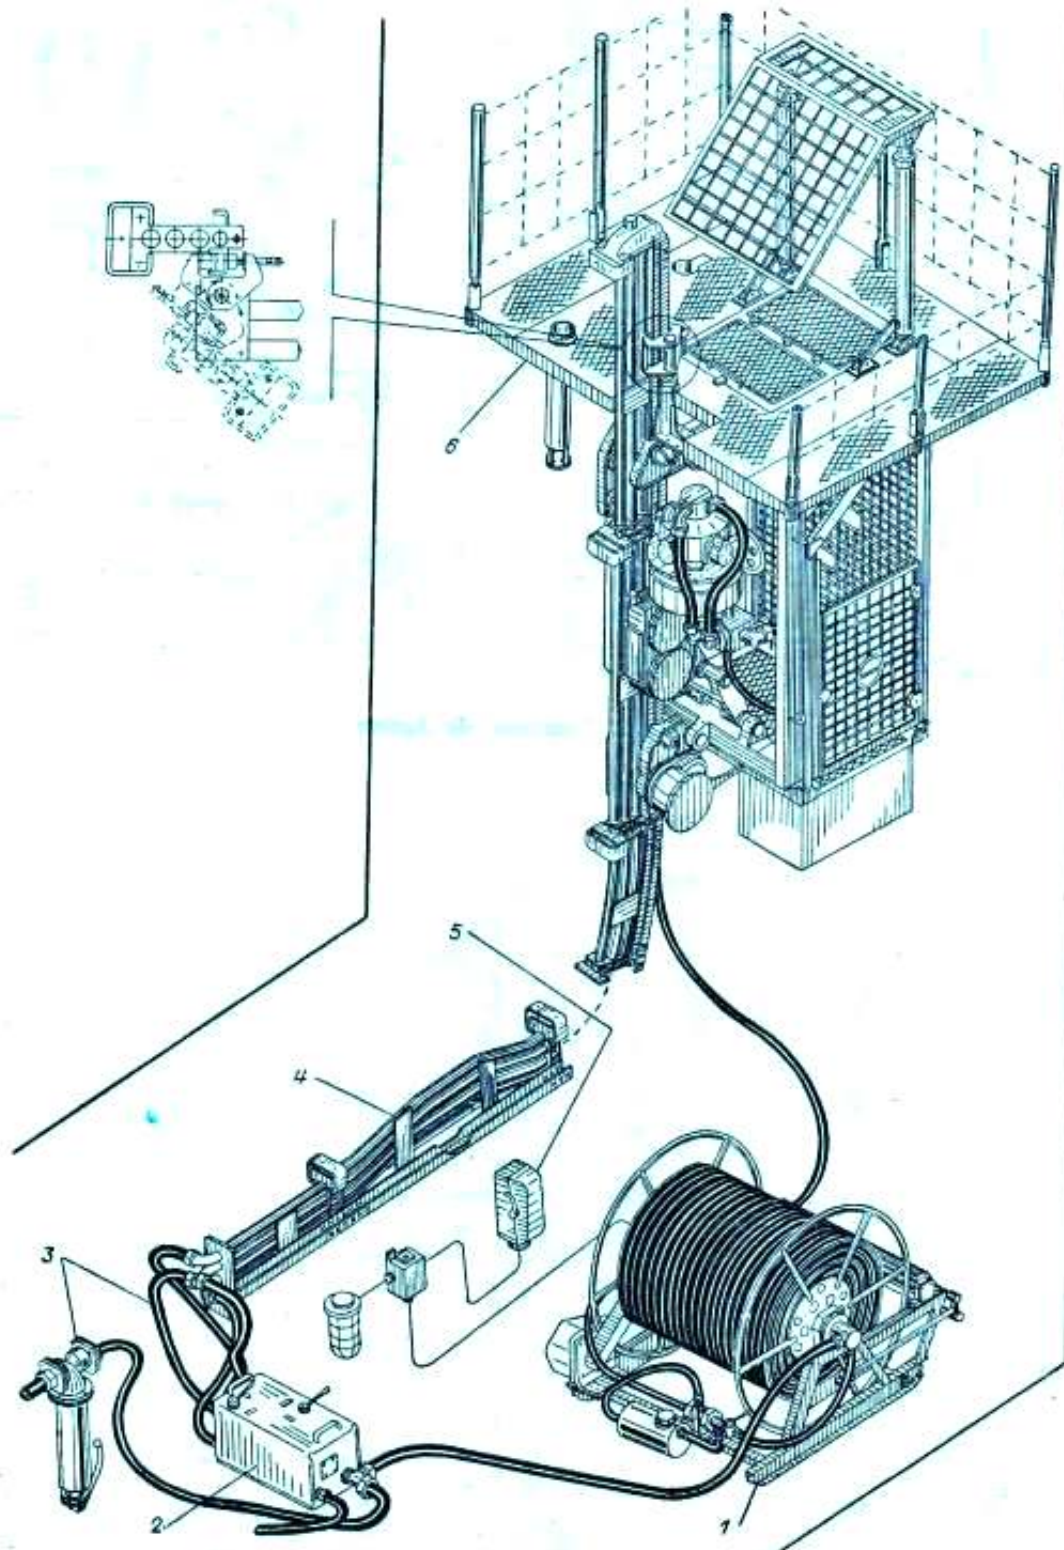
KIB-4A Raise Driving Integrated Outfit;
